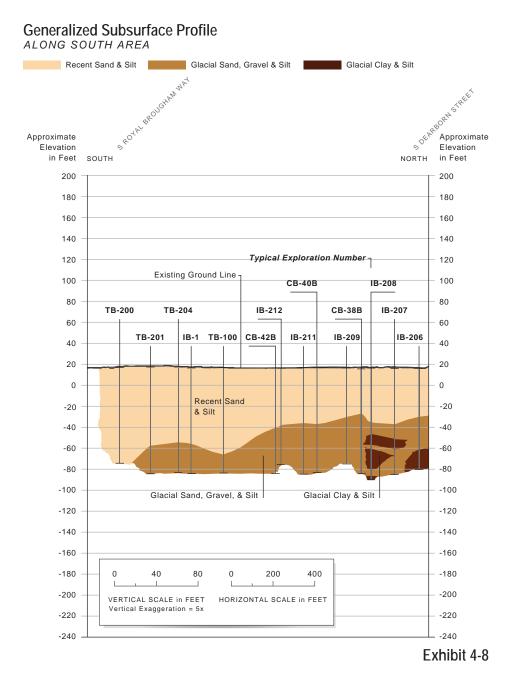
shows a generalized subsurface profile along the south area. This exhibit depicts three generalized soil groups:
